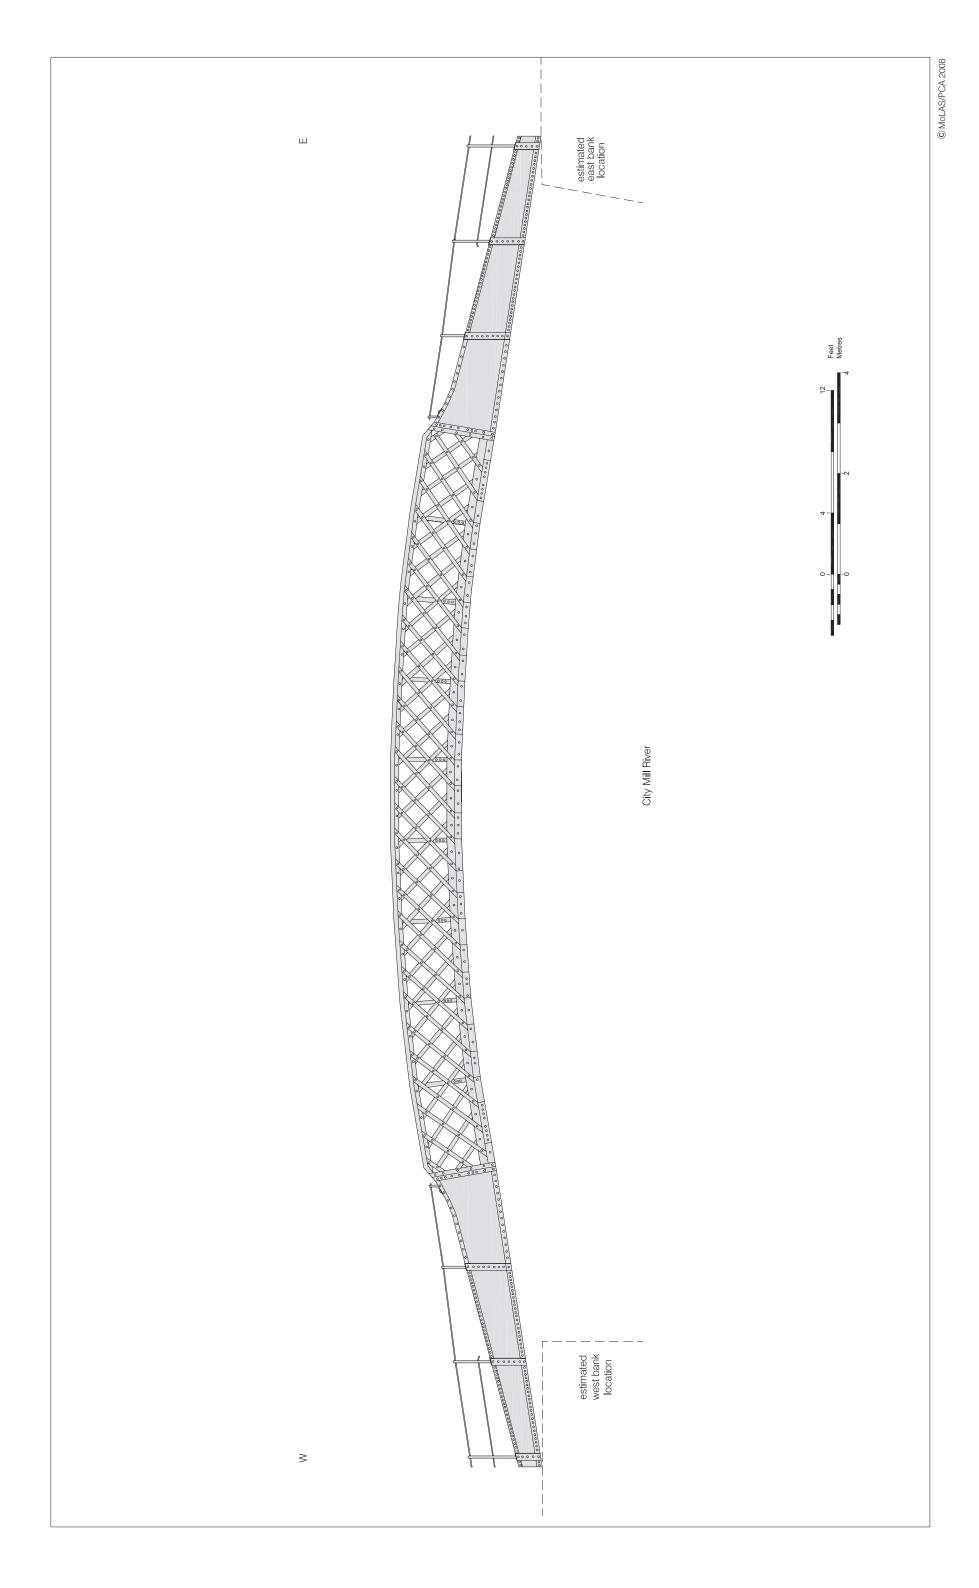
South elevation of City Mill River Footbridge: OL-03507 1:75 at A3
